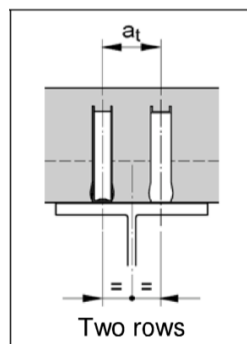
Transverse sheeting with two rib stiffeners and parallel connectors.
